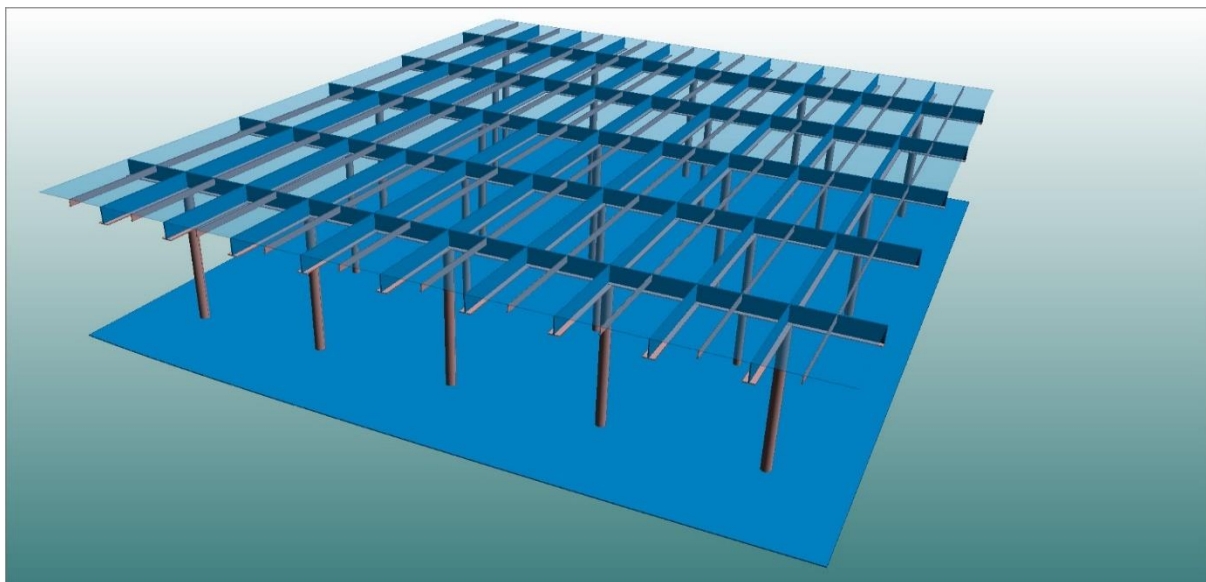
Example of pillars in a matrix with automatic connections to girders and the deck below
